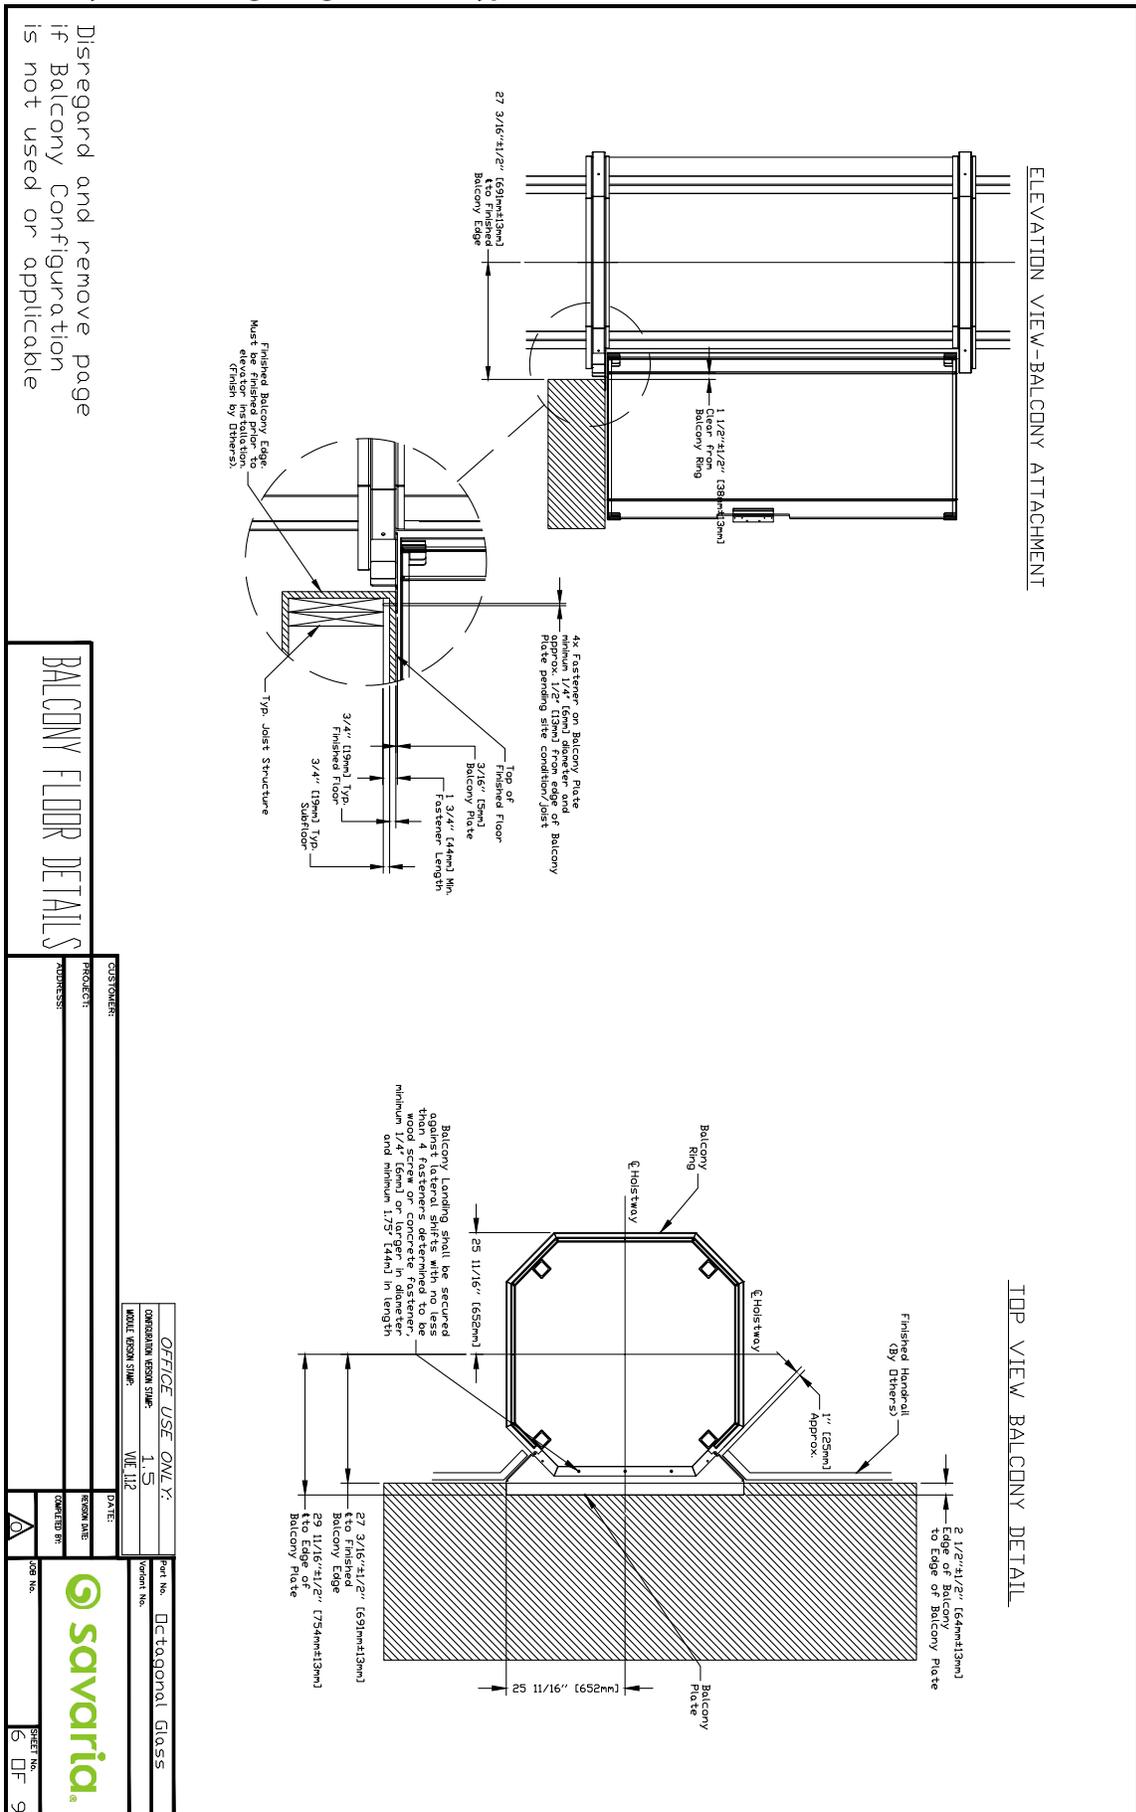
Elevation view - octagonal glass (OGM) type 1, 2 or 3
